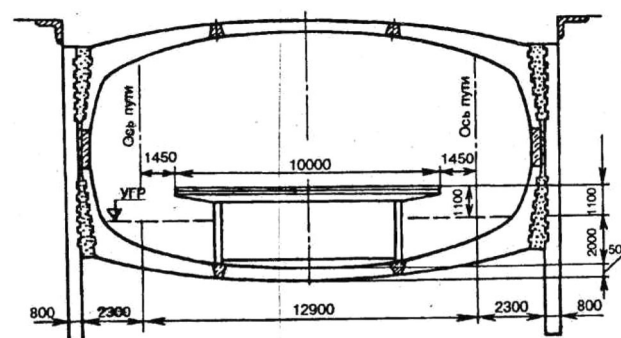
Open-excavation prefabricated arch metro station in Minsk
